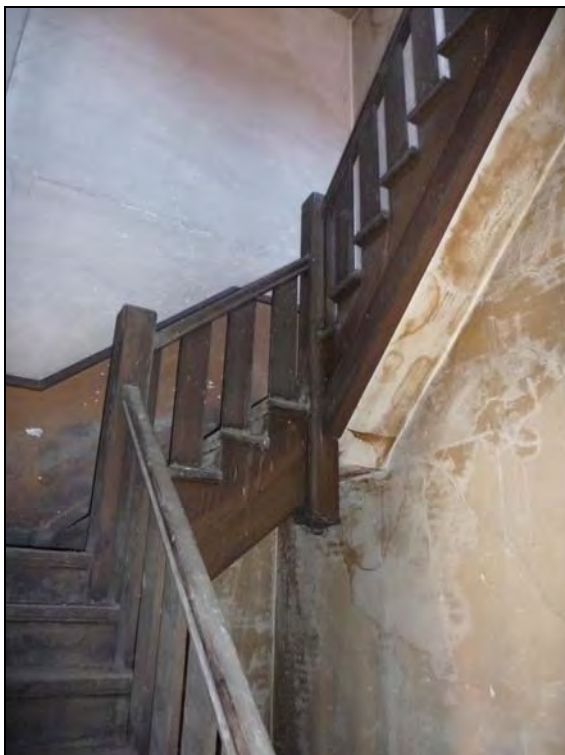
Left, view looking southwest at the stairwell and balustrade at the third floor.
